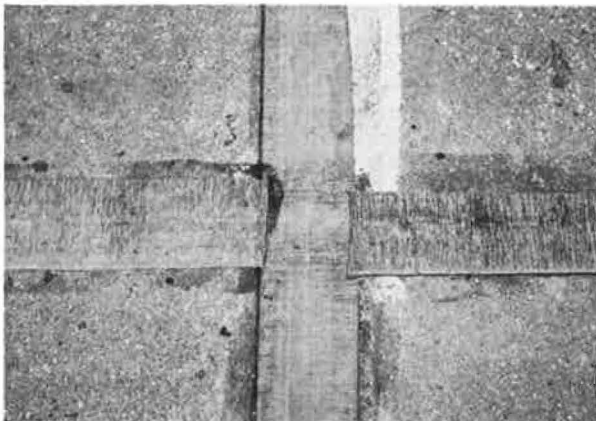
Georgia test site showing cutoff trench, water diversion, and part of section G1.
